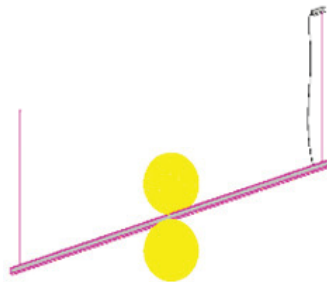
Sample Electrical Lighting Fixture 3D-View in Revit
